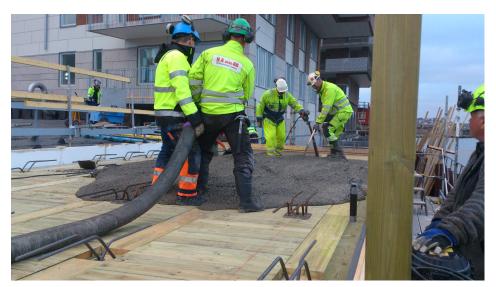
Casting of the concrete slab during the construction of the quay. Some of the rebars that are soon to be cast into the concrete are visible. (ÅF, 2015)
